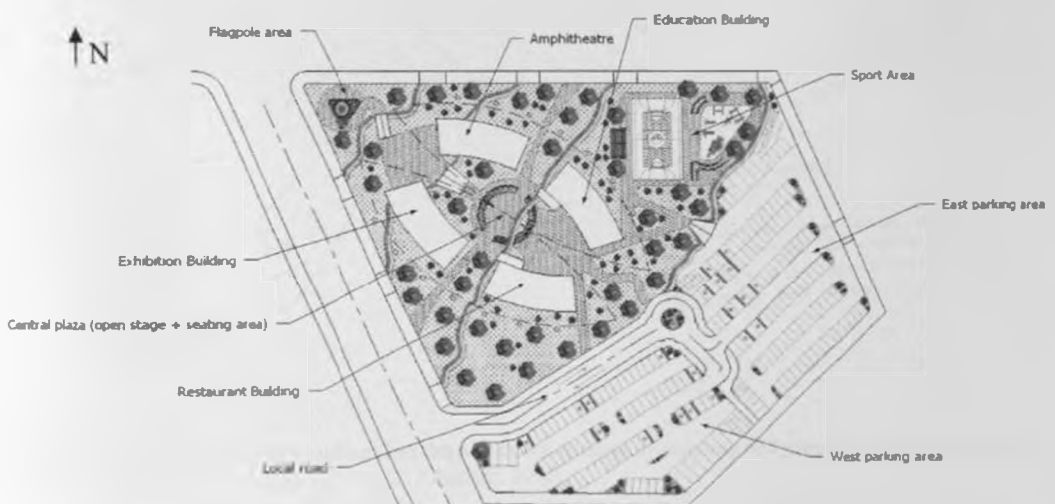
9 – Site plan and its division. Source: Author. 2013.
